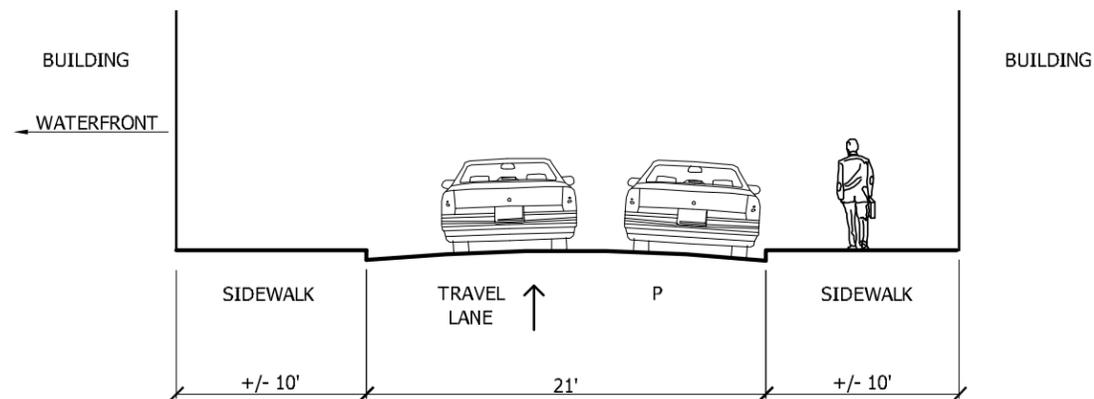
Existing configuration on Plymouth Street looking west from Jay Street
